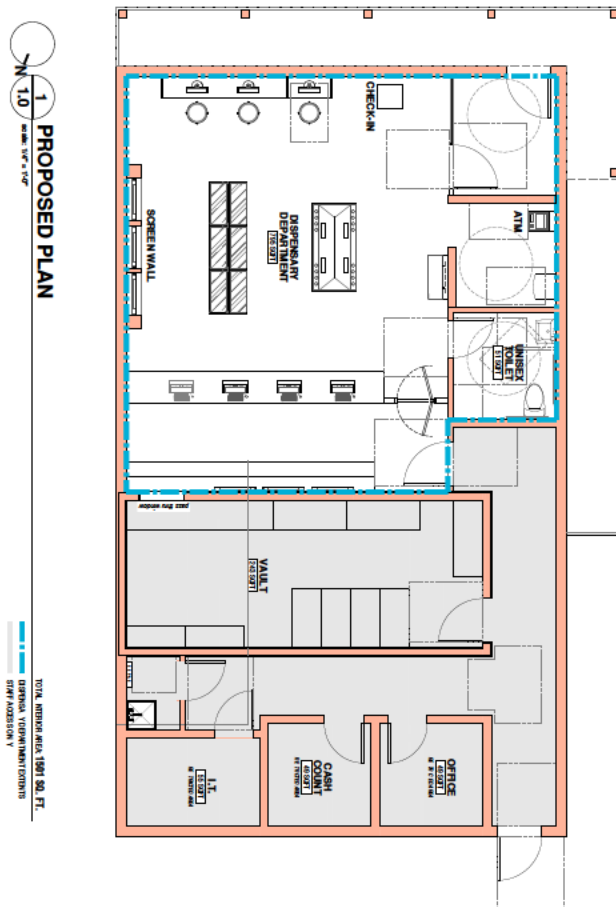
Engineering Plans and Specifications (Cultivation Facilities)
